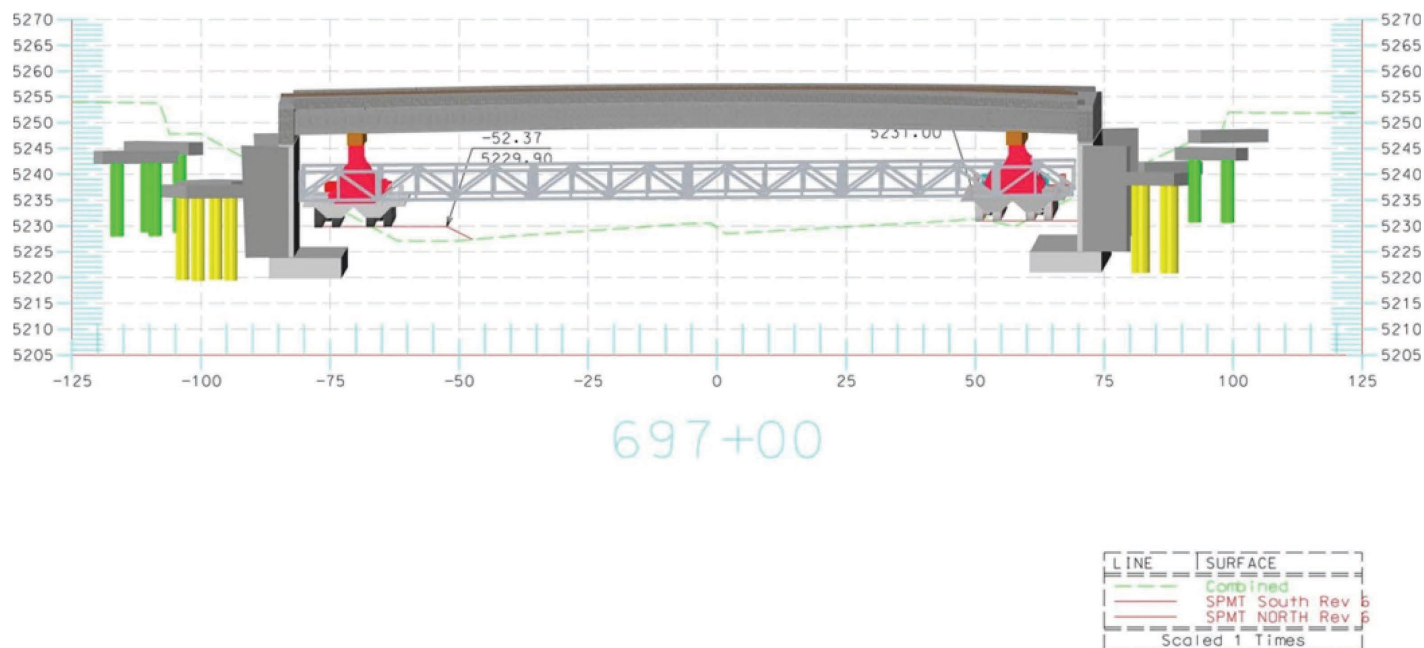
Cross section of SPMTs and the bridge in final location. (Source: Kiewit.)
